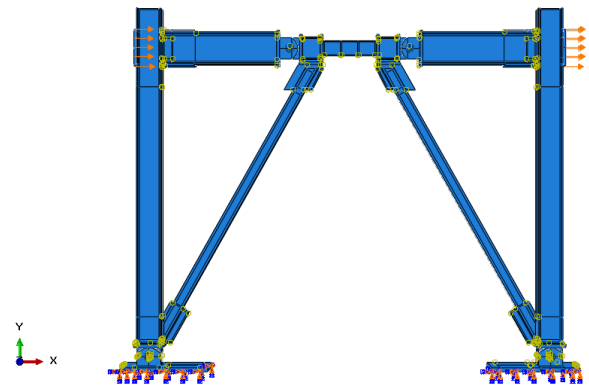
The location of the lateral load at the level of the floor ceiling.
